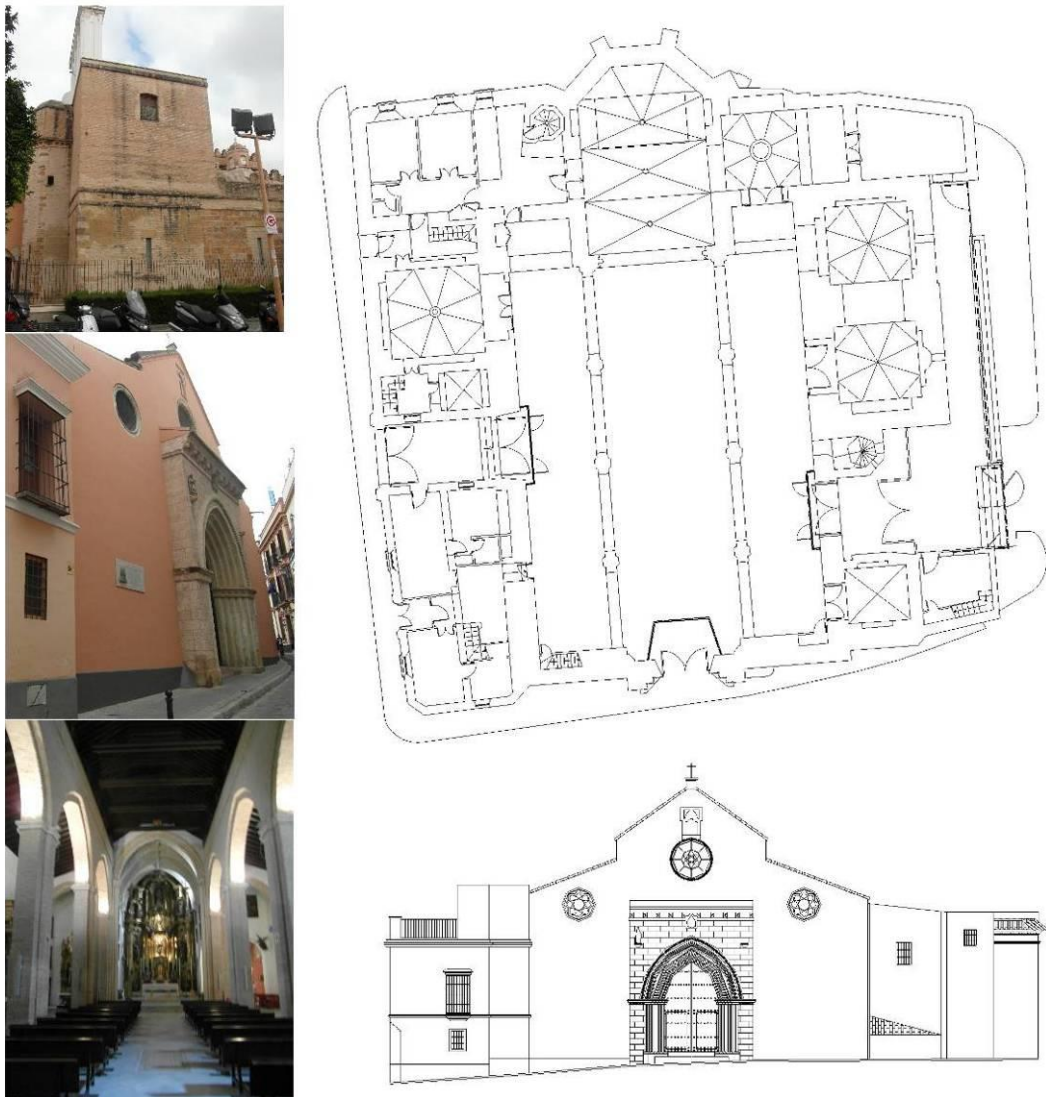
General views of San Andres. Planes of floor and elevation (PEPCH Sector 8.2 San Andrés-San Martín).
